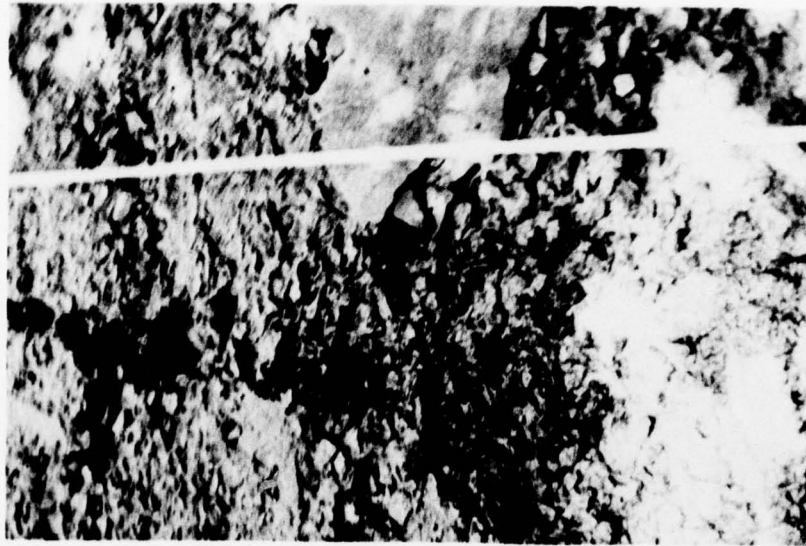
Concrete deterioration and spalling in downstream face of spillway at joint.
